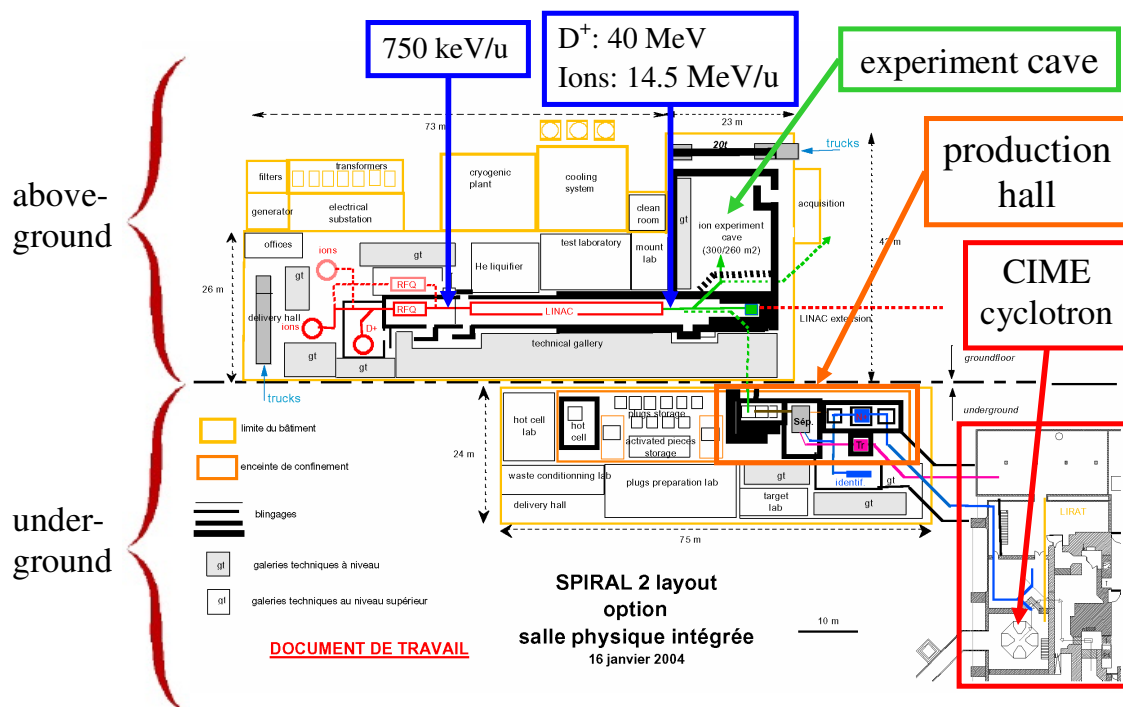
Layout of the SPIRAL 2 facility. Top: floor plan of the ground floor. Bottom: floor plan of the underground level. The lower right region marked by the red rectangular belongs to the already existing SPIRAL facility.
